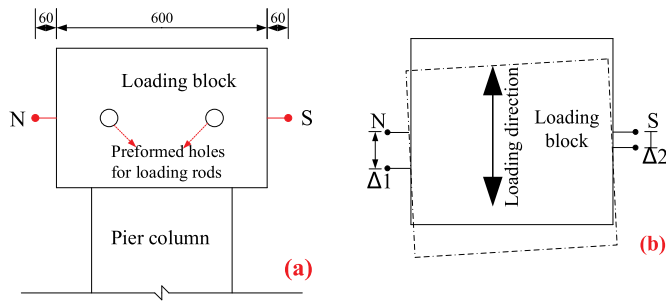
Measurement of torsional displacement at the loading block of bridge column specimens, (a) elevation view, (b) top view.
